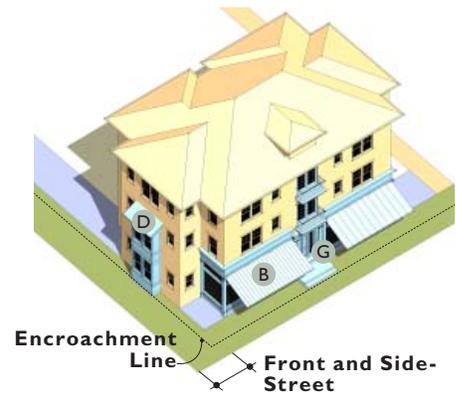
Example of various building elements (blue) that are permitted to encroach on the Front and Side-Street Yard (green)
